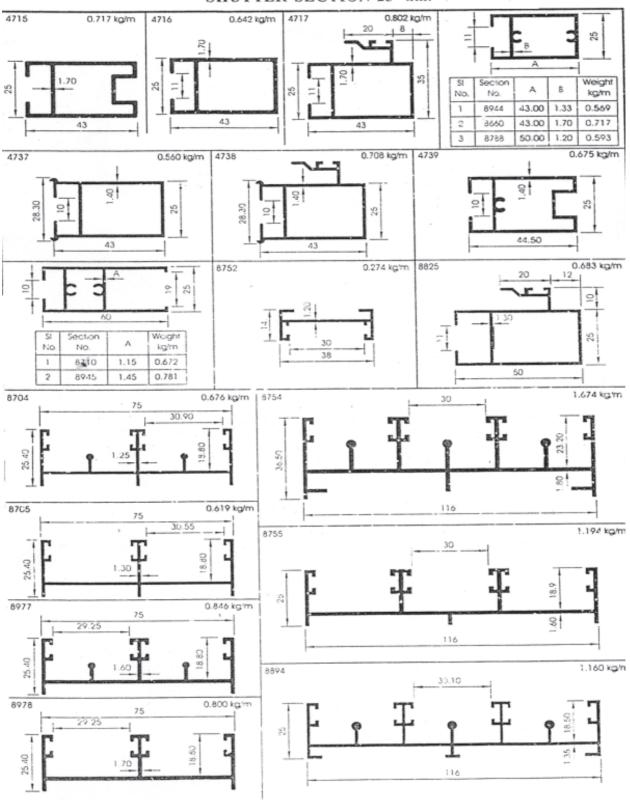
DETAILS OF SLIDING WINDOW SECTIONS SHUTTER SECTION-20 mm.
